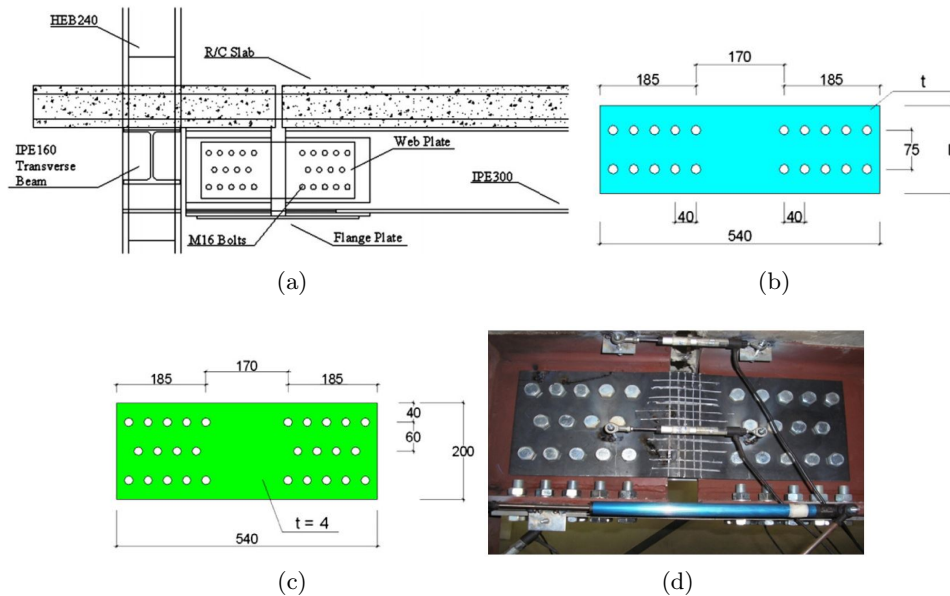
(a) Bolted fuse plate connection and (b) experimental tests on the bolted fuse web and flange plates(Castiglioni et al., 2012b)
